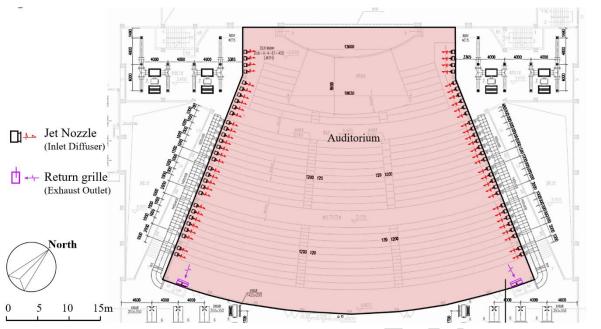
Building floorplan of the auditorium and the air ventilation systems.
